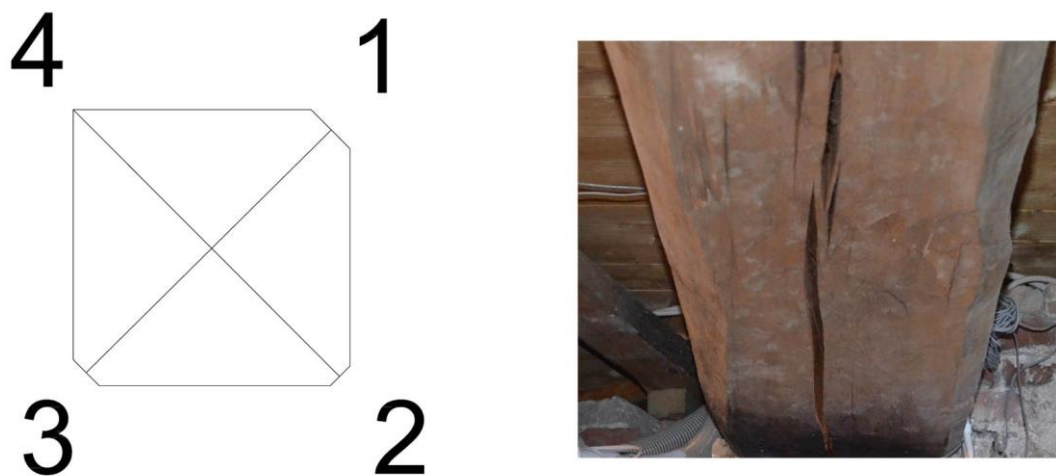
Definition of nomenclature for trimmed corners seen in the direction from beam 1 towards beam 2 regarding secondary beams and from beam A towards beam B regarding primary beams (Left) and example of real trimmed corners (Right).
